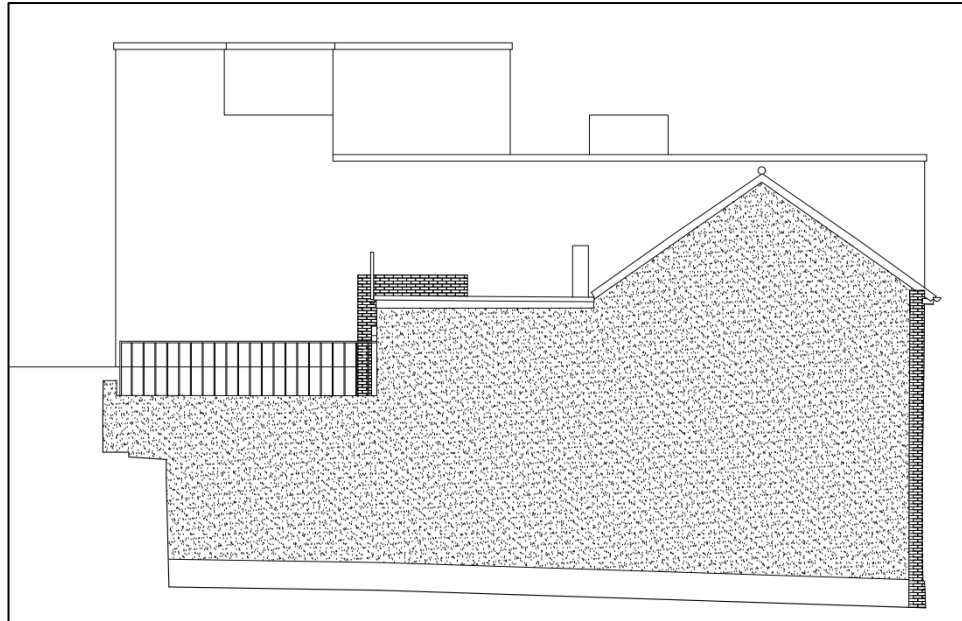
side elevation to Towy Works open yard, but with neighbouring building shown in background for context of massing and scale
